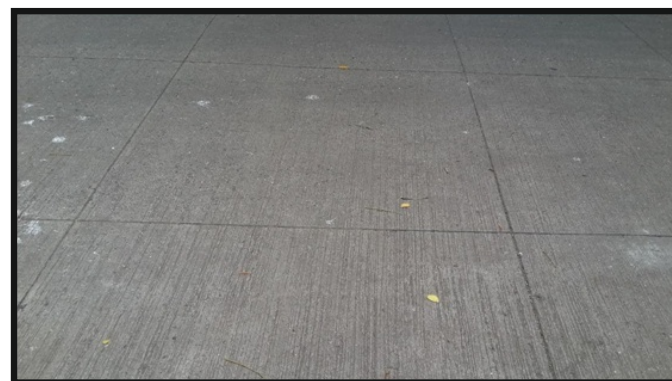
TWT Pavement with Saw Cut Joints and Textured Surface with Broom Finish
